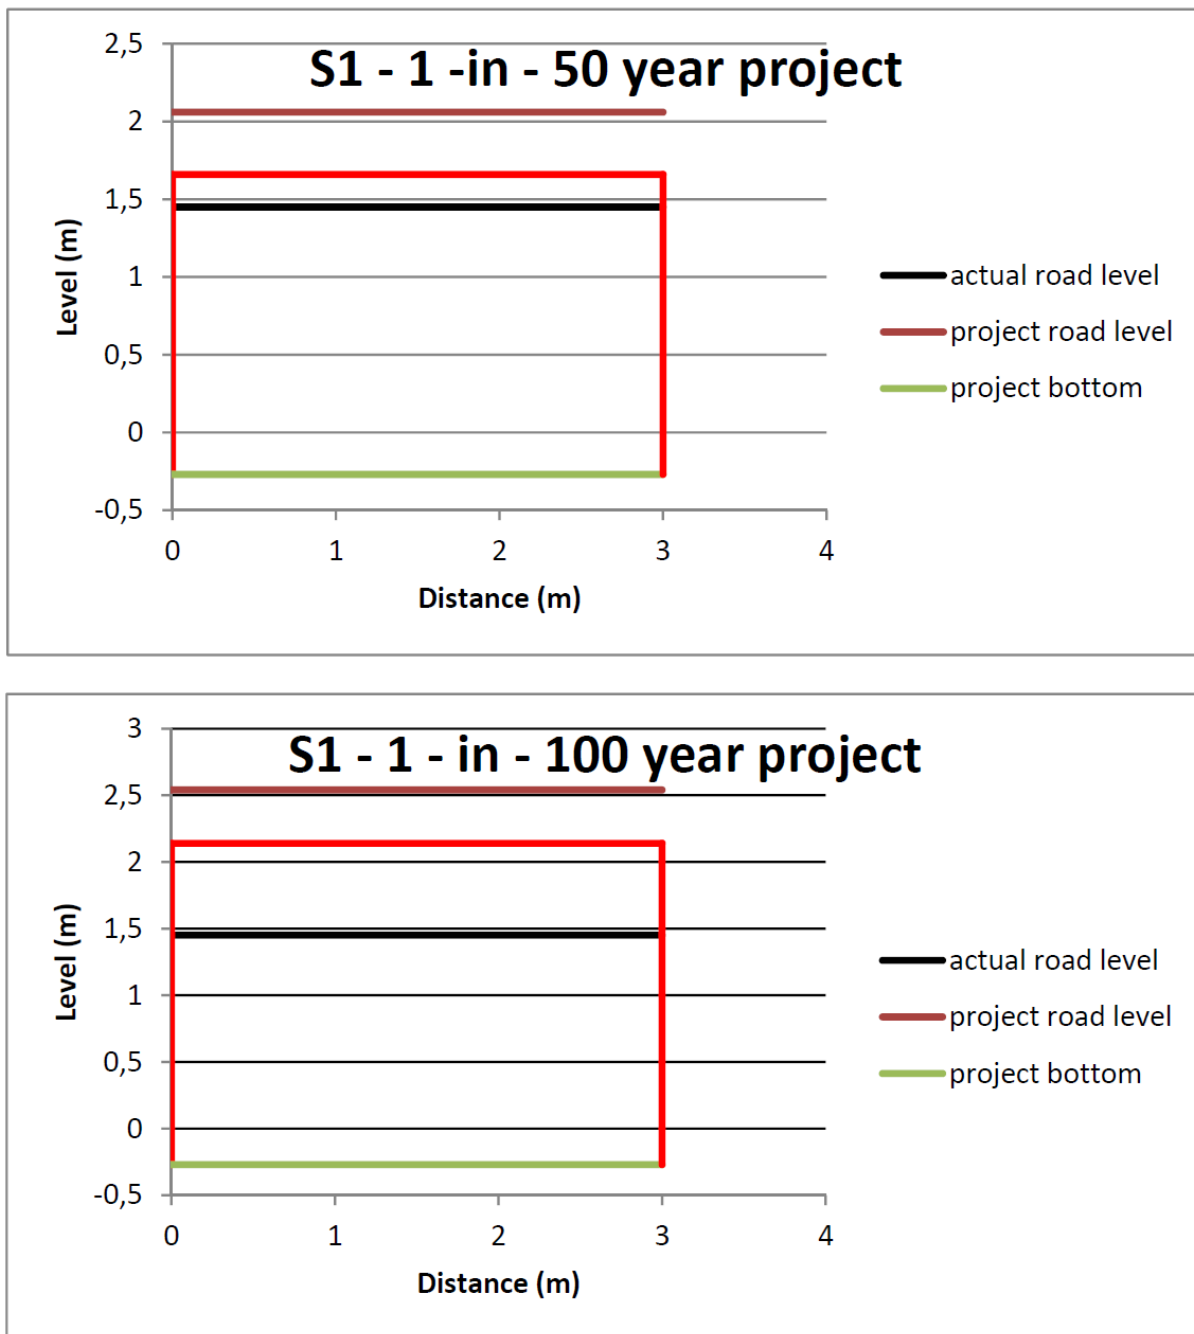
Standard cross section of hydraulic structures under Church Street– Sol 1
